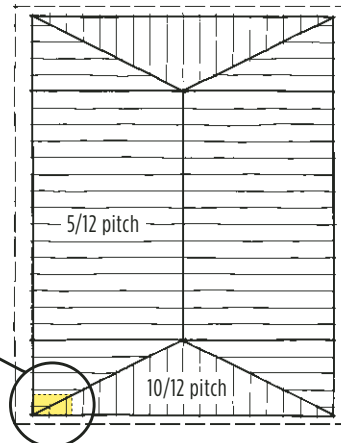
The full-scale drawing for an irregular hip roof begins with a basic rectangle — a plan view that represents a corner of the roof. The sides are the two common runs; the diagonal is the hip rafter.
